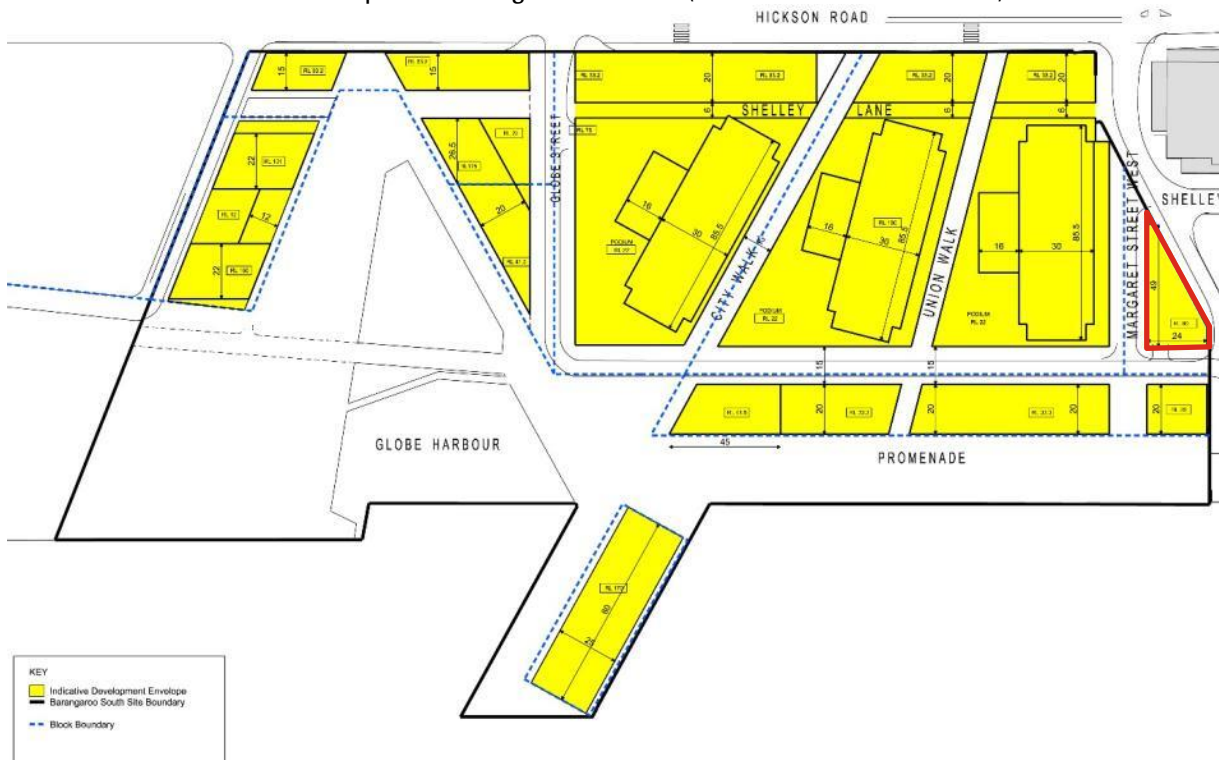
Building R7 (red outline) in relation to the approved Concept Plan (Mod 7) Indicative Building Layout
